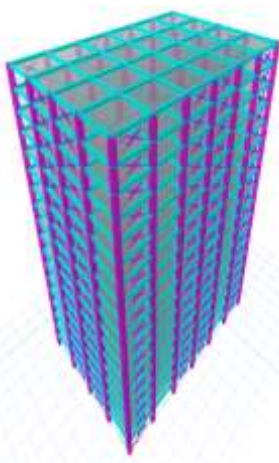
Elevation of 18-Storey Conventional Braced System
